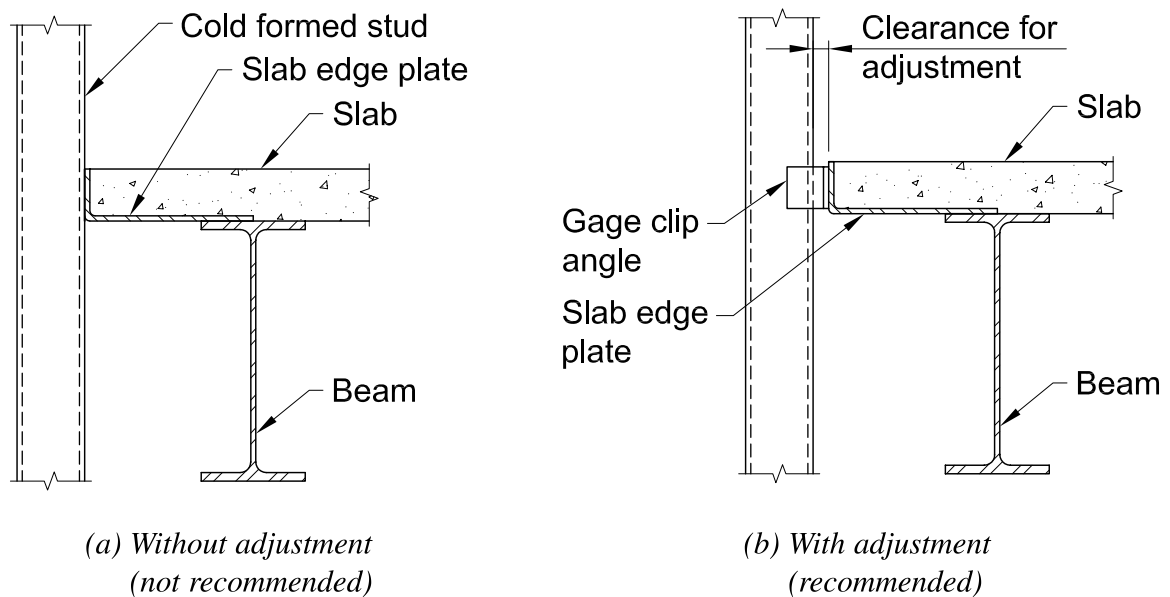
Attaching cold-formed steel façade systems to structural steel framing.
